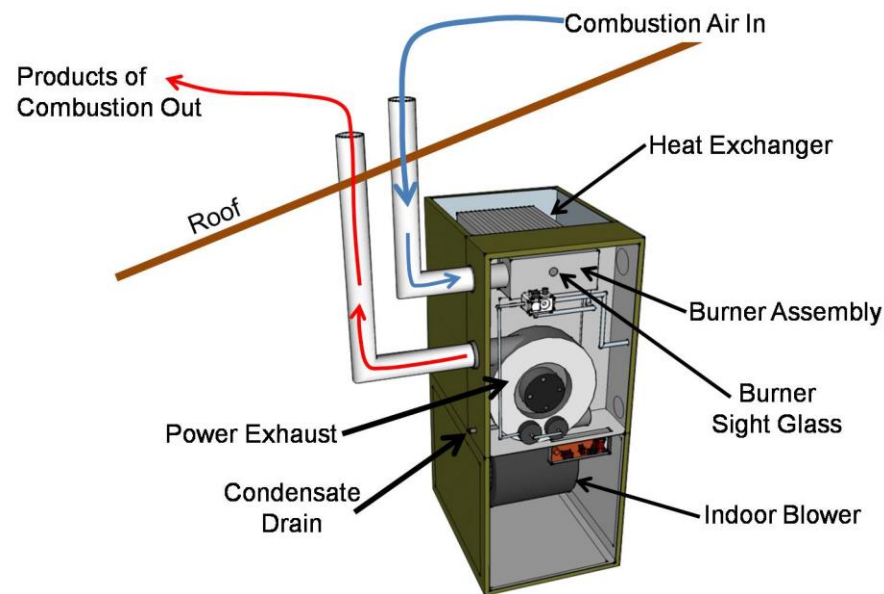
A direct-vent sealed-combustion furnace with dedicated pipes for combustion air and exhaust installed continuous to the outside
